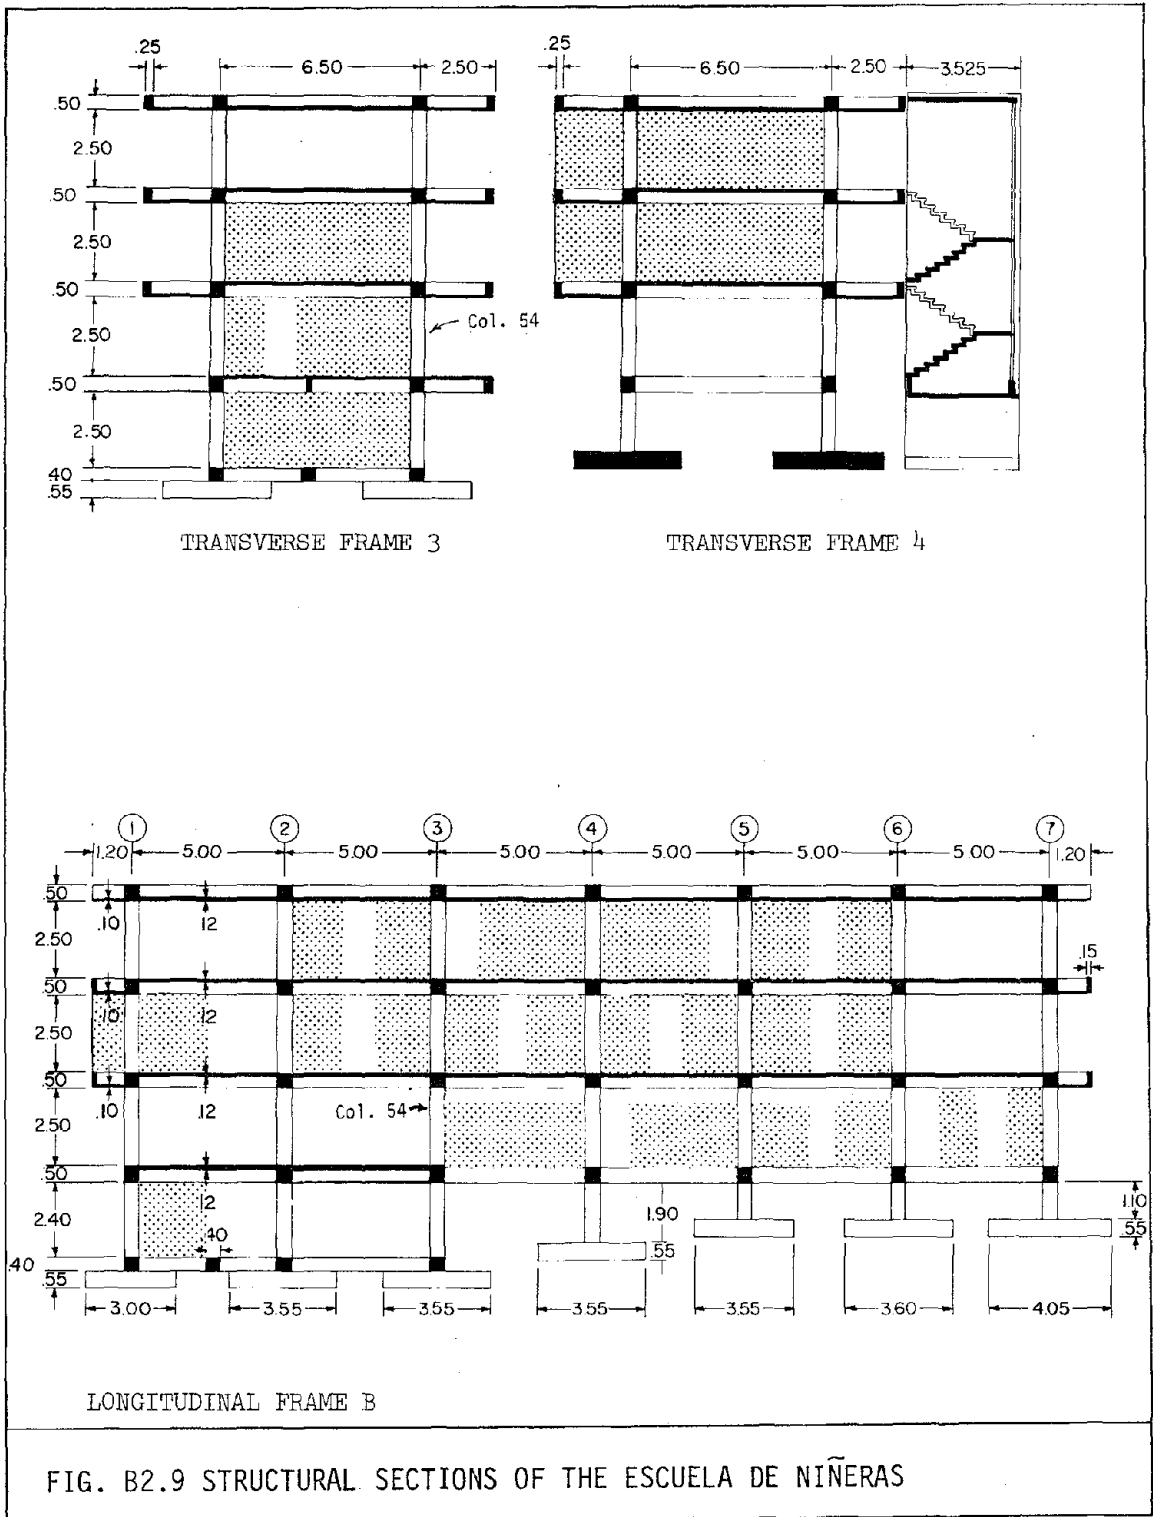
STRUCTURAL SECTIONS OF THE ESCUELA DE NIÑERAS
